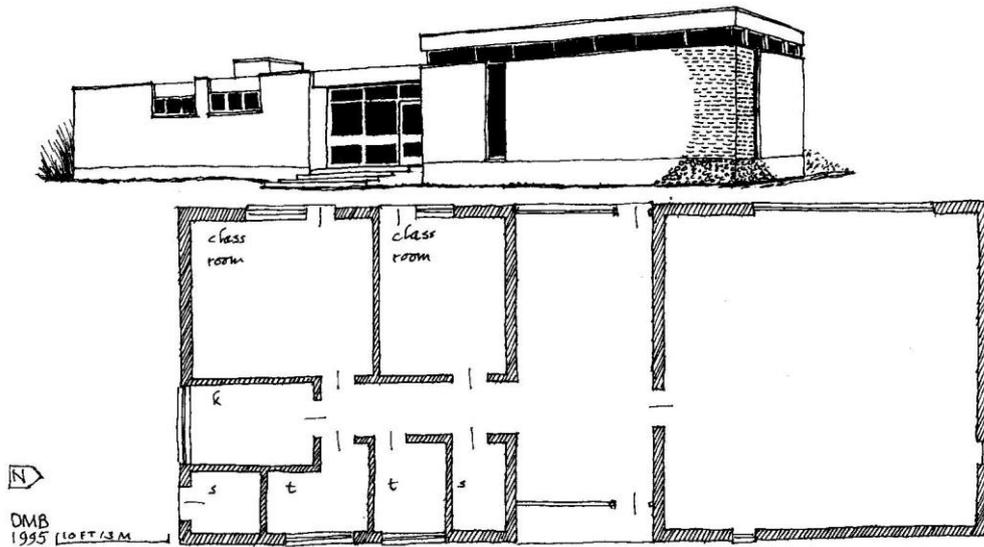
The ground plan and perspective view of the original building from *Butler* vol 1 p.189
